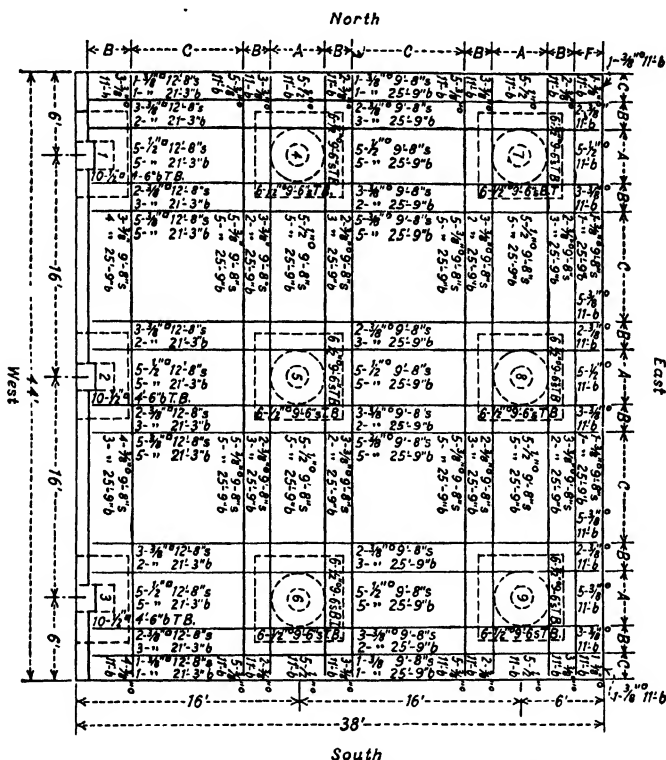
Steel Layout, Slab J. (See p. 99.)
